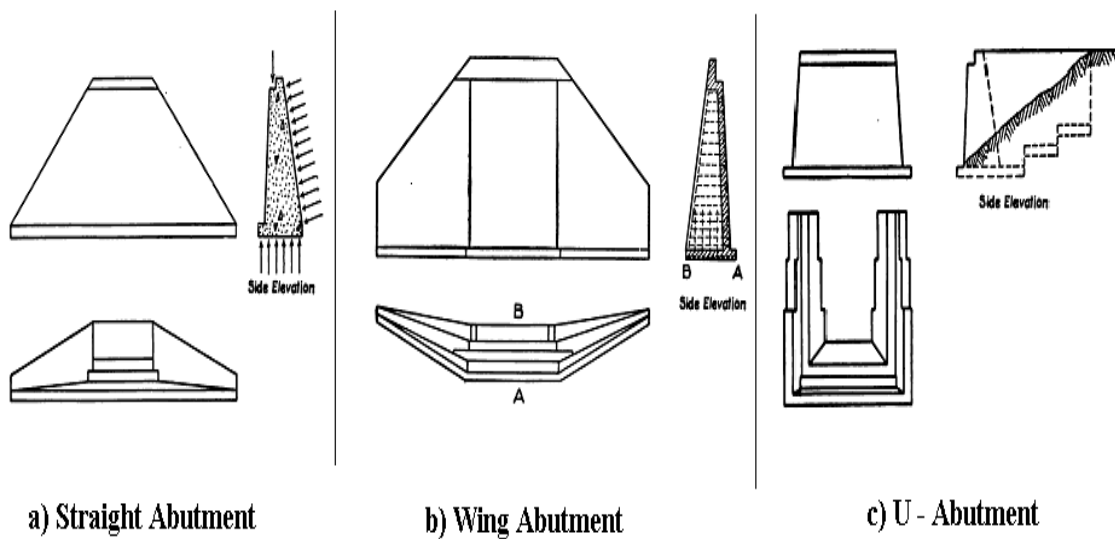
Some examples of abutment shapes (Spalding 1921).
